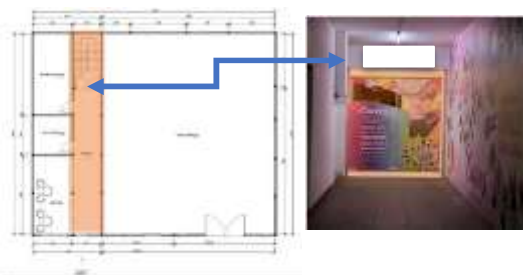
1st Floor Lay Out – Dividing Private Area and Public Area
